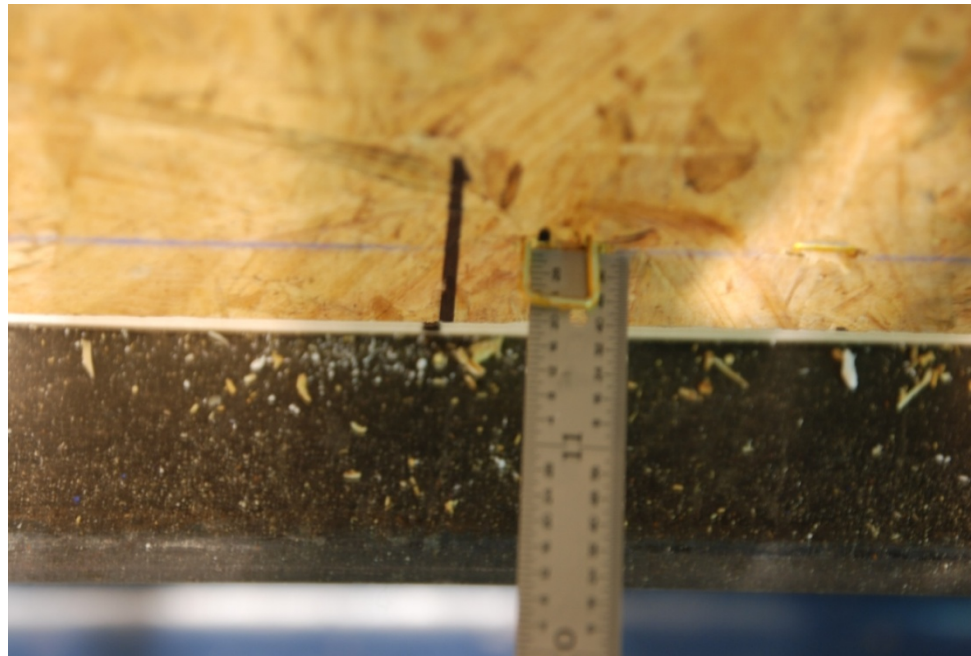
Shearing and pull-out of staples along base plate of Specimen A3-2C(2) after failure
